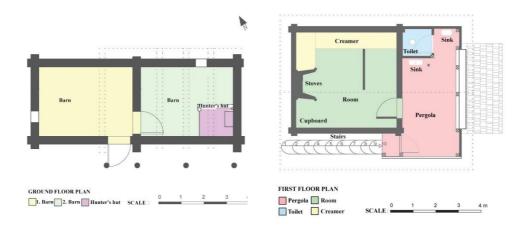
For example, the ground floor and first floor plan diagram of a highland dwelling (Soydan, 2024).
